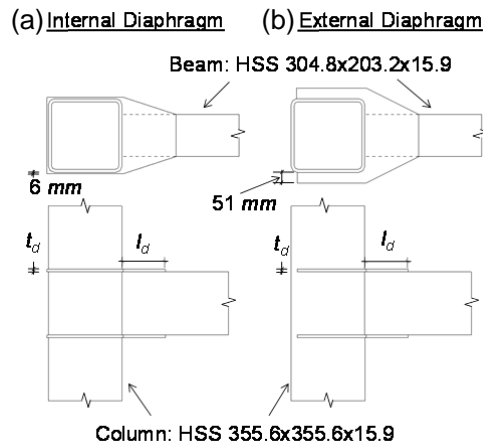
Detail for the (a) internal diaphragm and (b) external diaphragm reinforced HSS-to-HSS exterior moment connections
